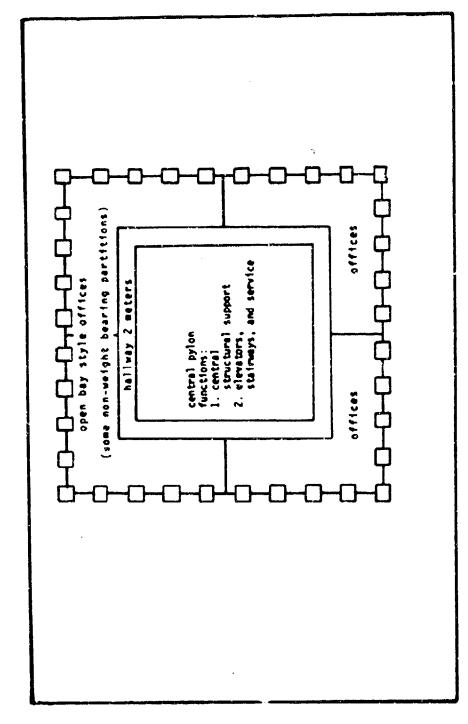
Steel/Concrete-Framed Tall (30+ Stories) Building with Central Pylon and Light Cladding Typical Upper-Floor Plan
